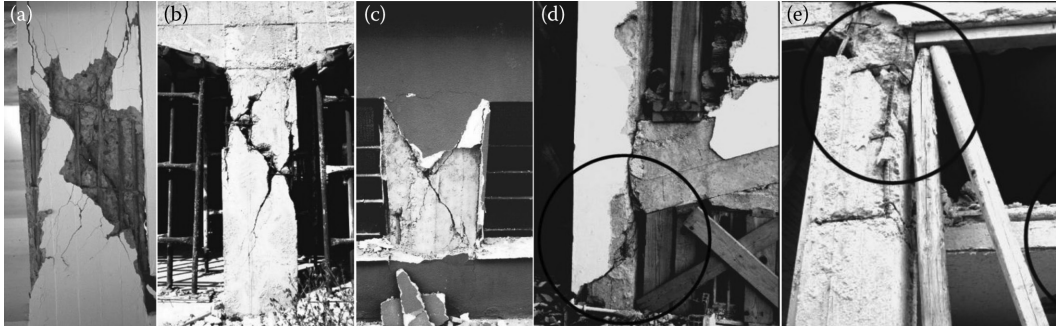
Shear failure of columns, (a)–(e), including a captive one between the basement perimeter wall and the beam (c) and short columns due to mid-storey constraint by a stair (d) or a landing (e) supported on the column.
